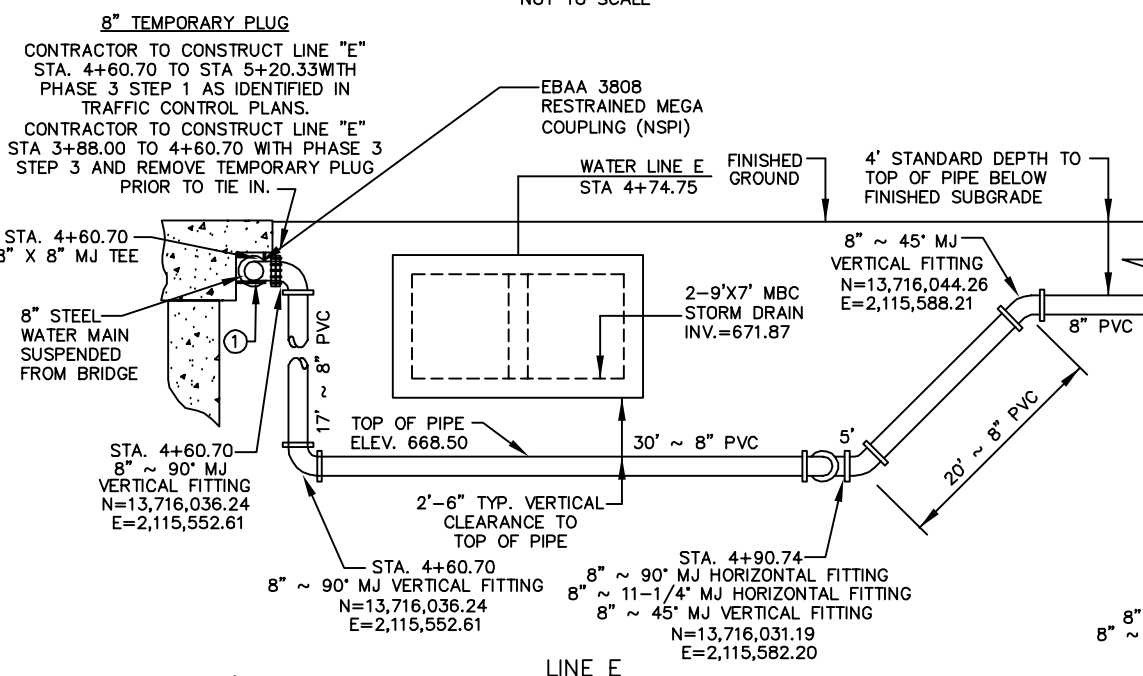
DOMESTIC WATER CROSSING UNDER SLOT DRAIN
